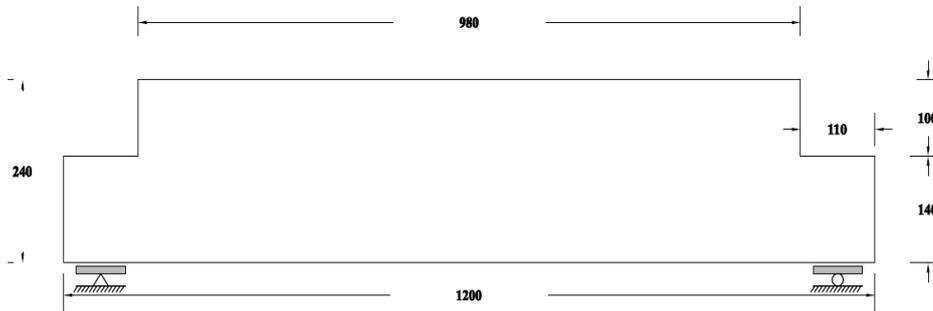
R.C. Beam Inverted Dapped Ends Girder Layout & Dimensions (mm).
